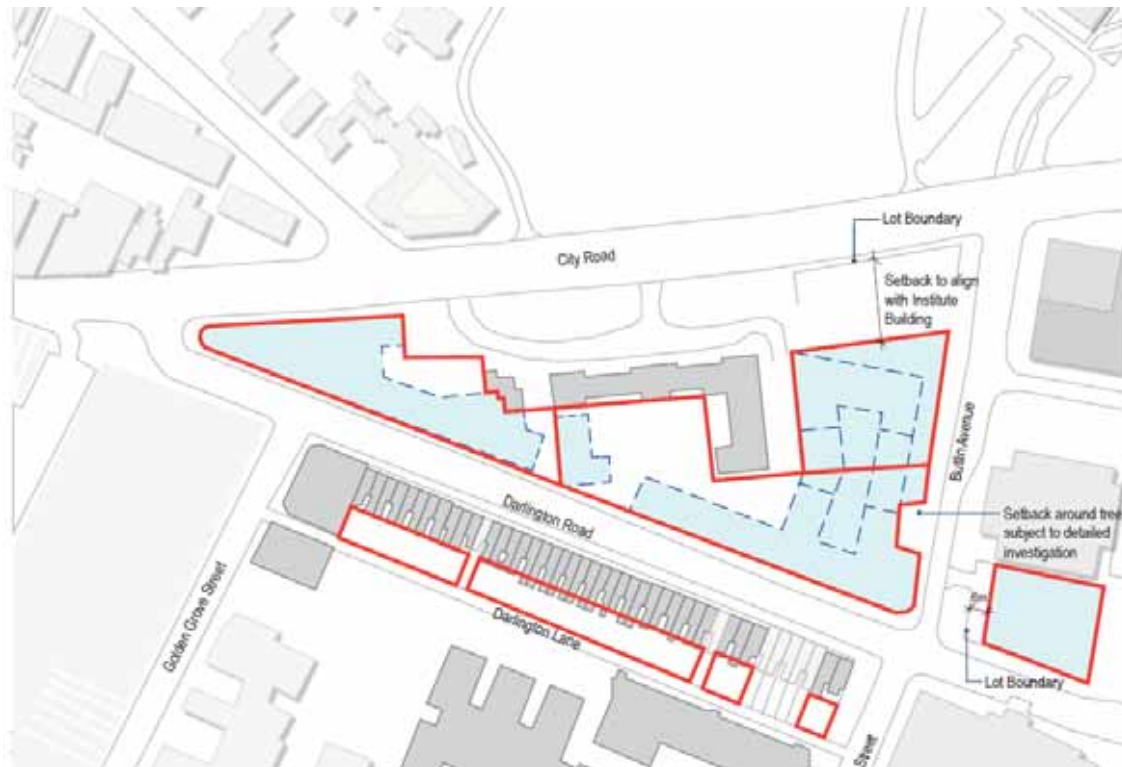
CITY ROAD PRECINCT ENVELOPE PLAN
